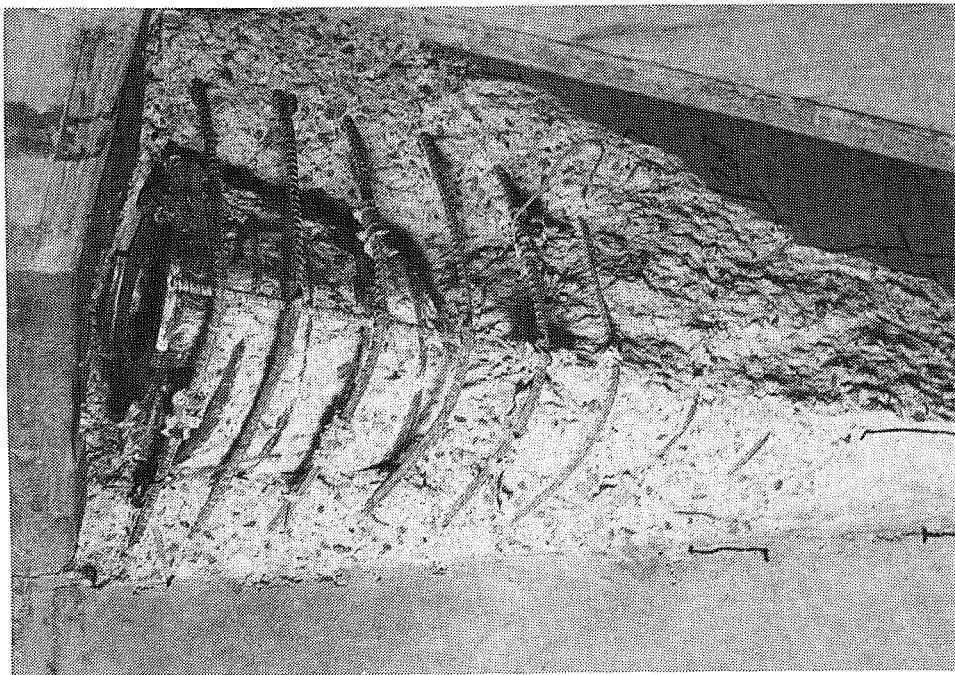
Specimen Corner22 After Removal of Loose Concrete
